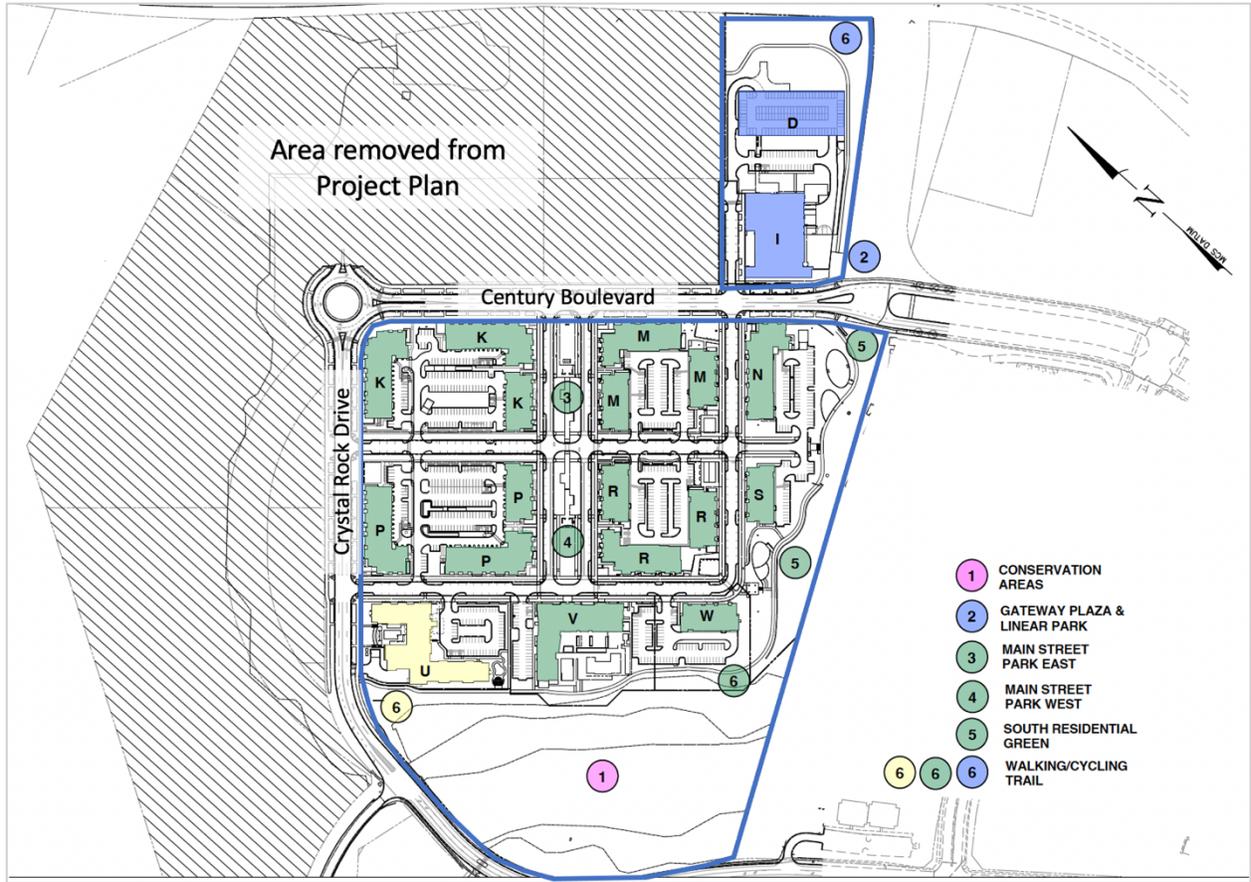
Existing public amenities in the Project Plan Amendment Area, buildings P and K are pending construction, all other building are completed
